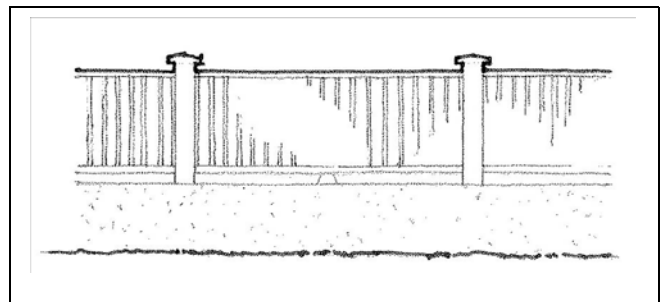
A design suitable for the Residential 2 zone, using plastered concrete or concrete block, with slender pillars and timber panels.
